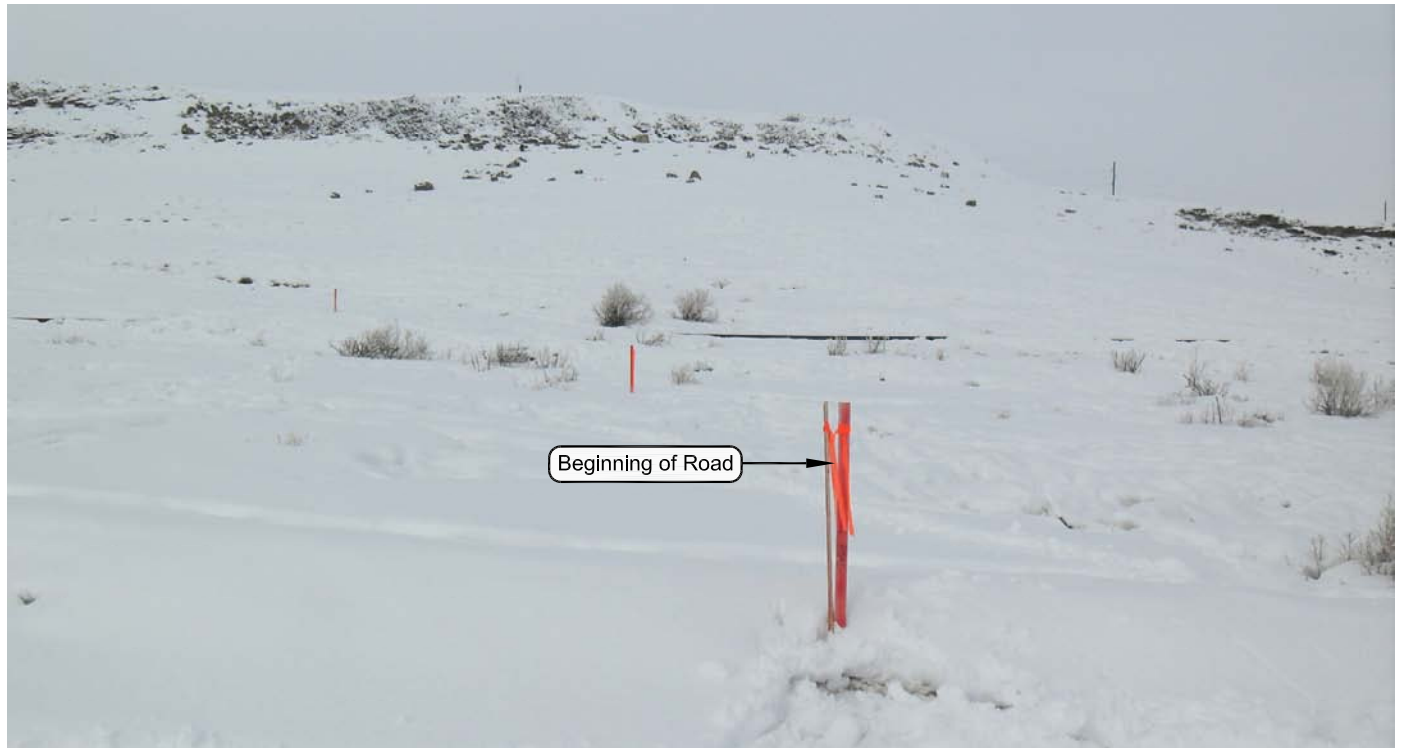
PHOTO VIEW: FROM BEGINNING OF PROPOSED ROAD
